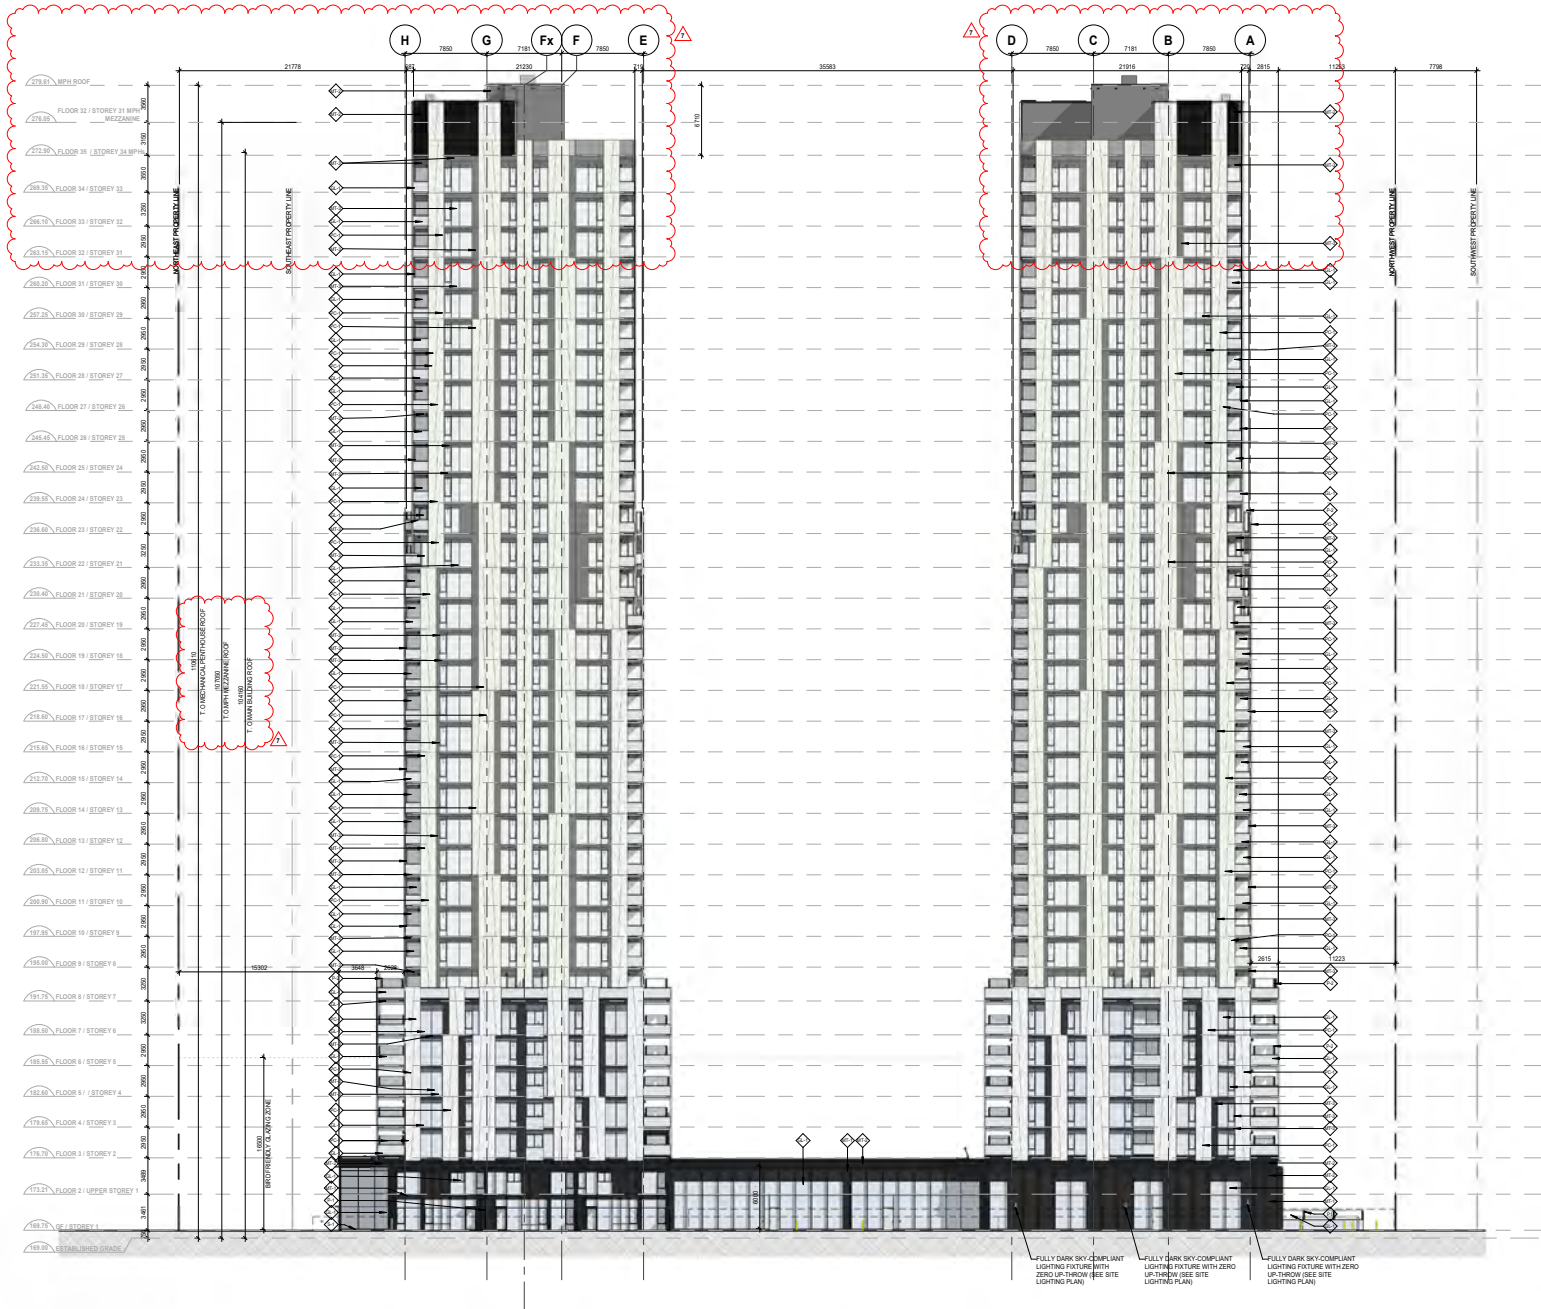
North Elevation by Quadrangle Architects Limited (not to scale)
